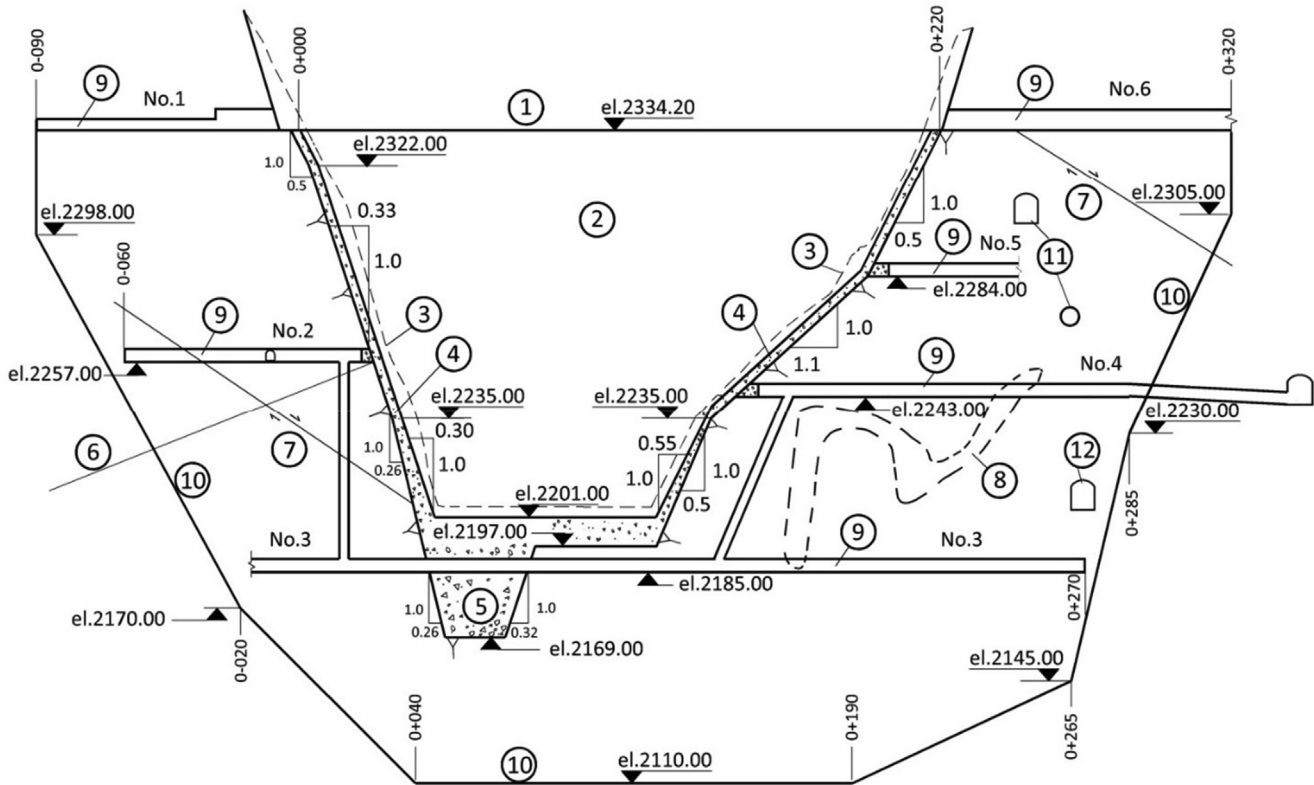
Longitudinal section along the asphalt core axis showing grouting galleries in the foundation. (1) crest; (2) asphalt core; (3) ground surface; (4) concrete plinth; (5) dam base concrete monolith; (6) rock joint; (7) fault; (8) karst caves filled with cement after being washed; (9) grouting and transportation gallery; (10) bottom level of grout curtain; (11) spillway tunnel; (12) diversion tunnel.
